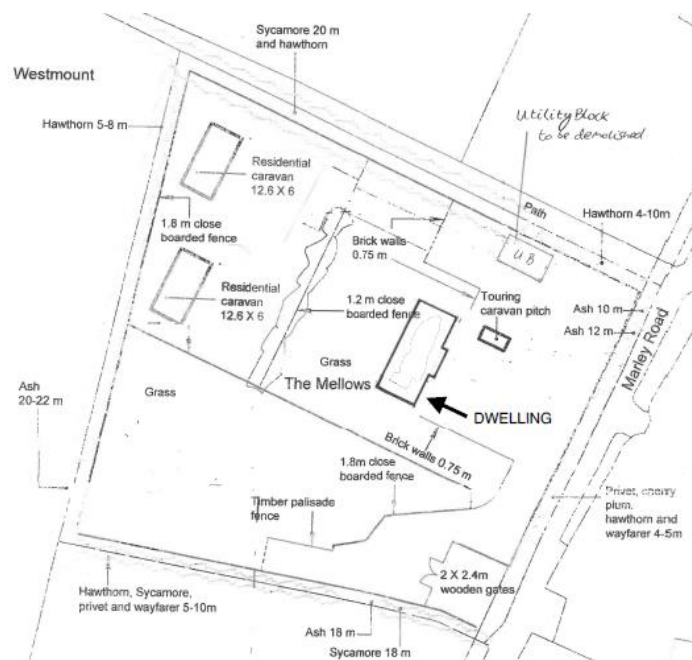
Block Plan submitted with the current application. (Retention of dwelling with alterations (Part Retrospective)
